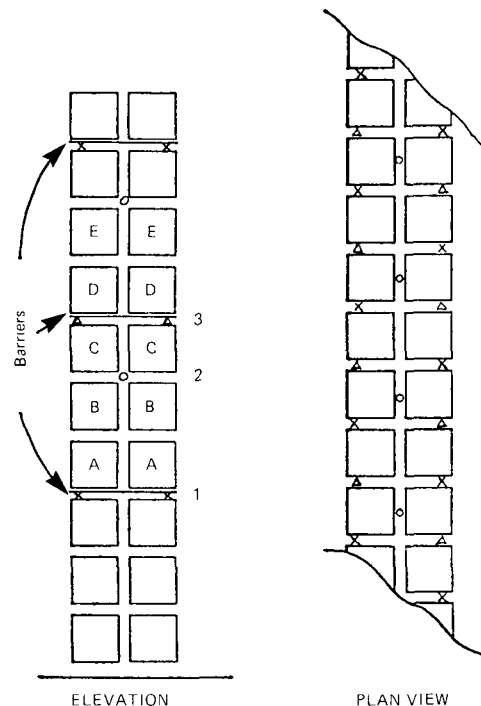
(a) In-Rack Sprinkler Arrangement, Group A Plastic Commodity, Height of Storage over 25 Ft.
